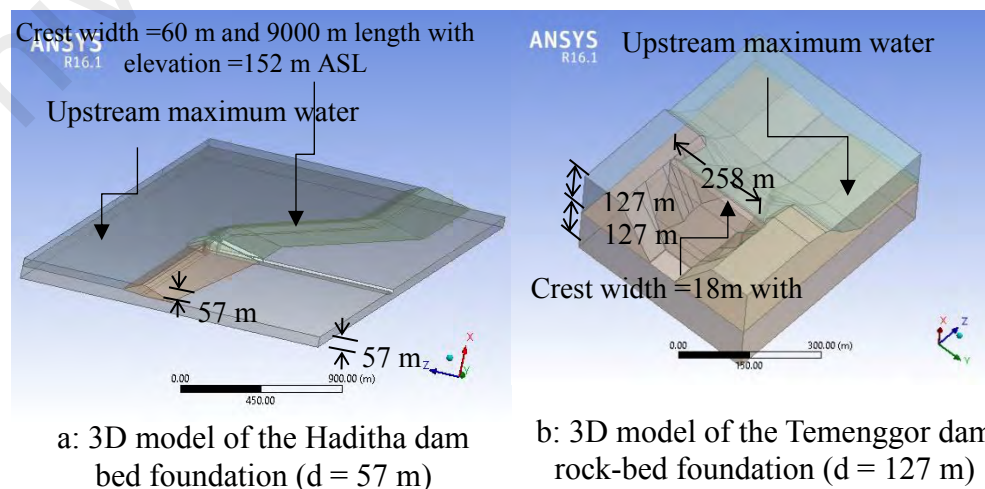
3-D models of Haditha and Temenggor dam-reservoir-foundation systems with shallow and deep foundation.
